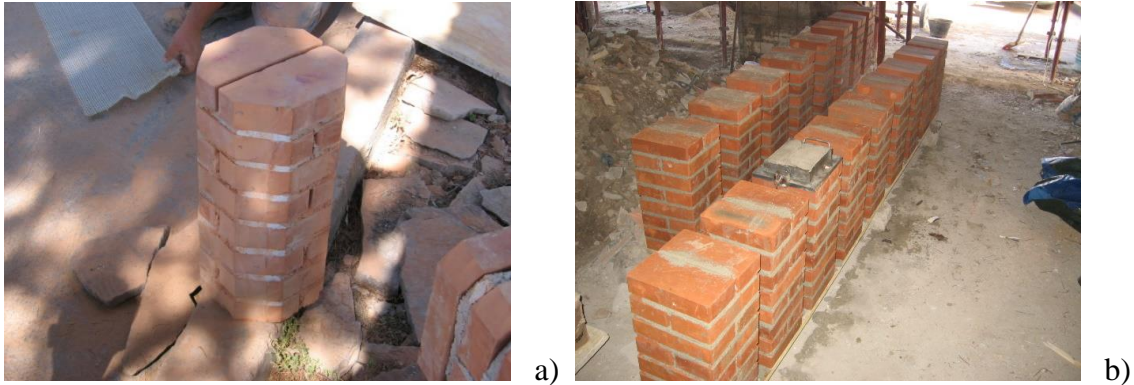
Brick columns: a) octagonal cross section, b) square cross section.
